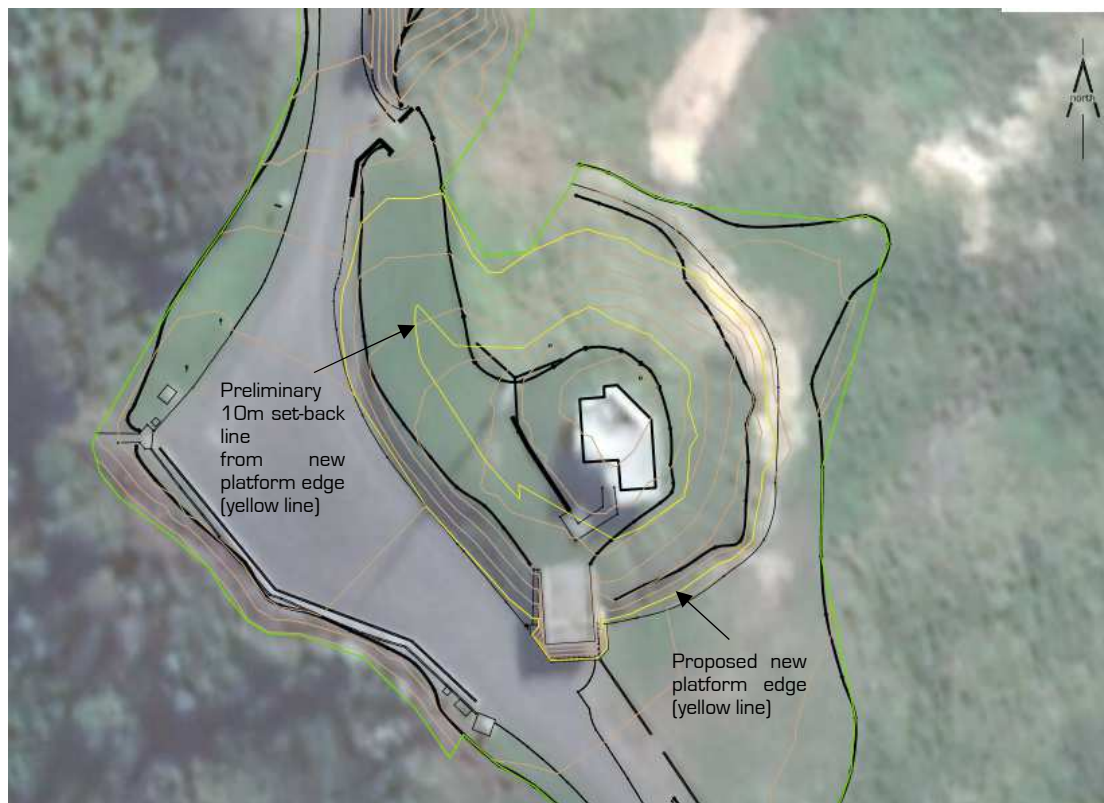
Aerial image showing approximate outline of proposed new platform if hill was to be cut down to approximately 98m above sea level and area of building zone available assuming a conservative 10m set-back from the edge of the building platform.
